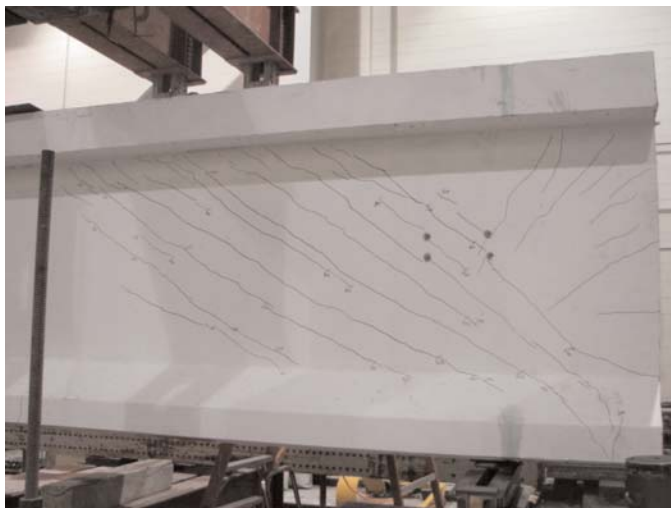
Shear cracks on End FL2R after loading was stopped.
